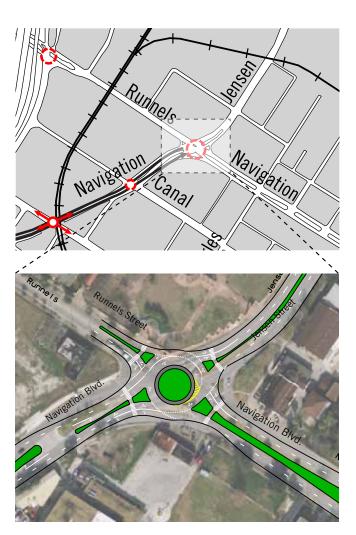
Conceptual Plan for Navigation Boulevard at Jensen / Runnels Roundabout
